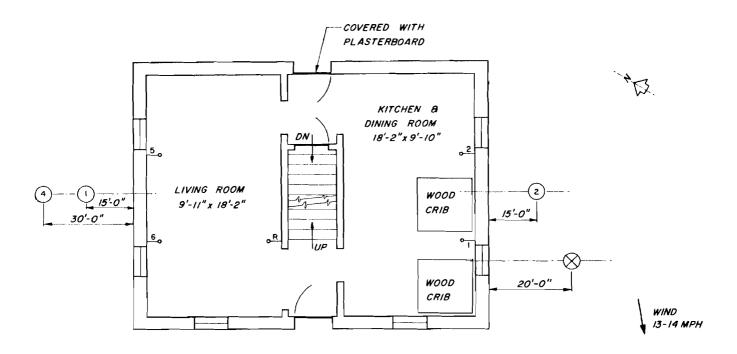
BUILDING No. 2 - TWO - STOREY SOLID BRICK DWELLING
